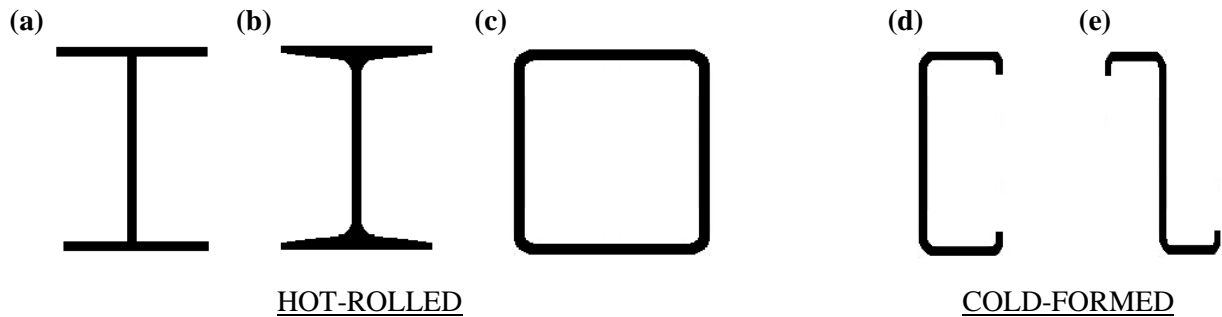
Basic steel sections used in lightweight metal building construction, including hot-rolled steel (a) W-beams, (b) I-beams, and (c) HSS-beams, and cold-formed steel (d) C-shapes and (e) Z-shapes.
